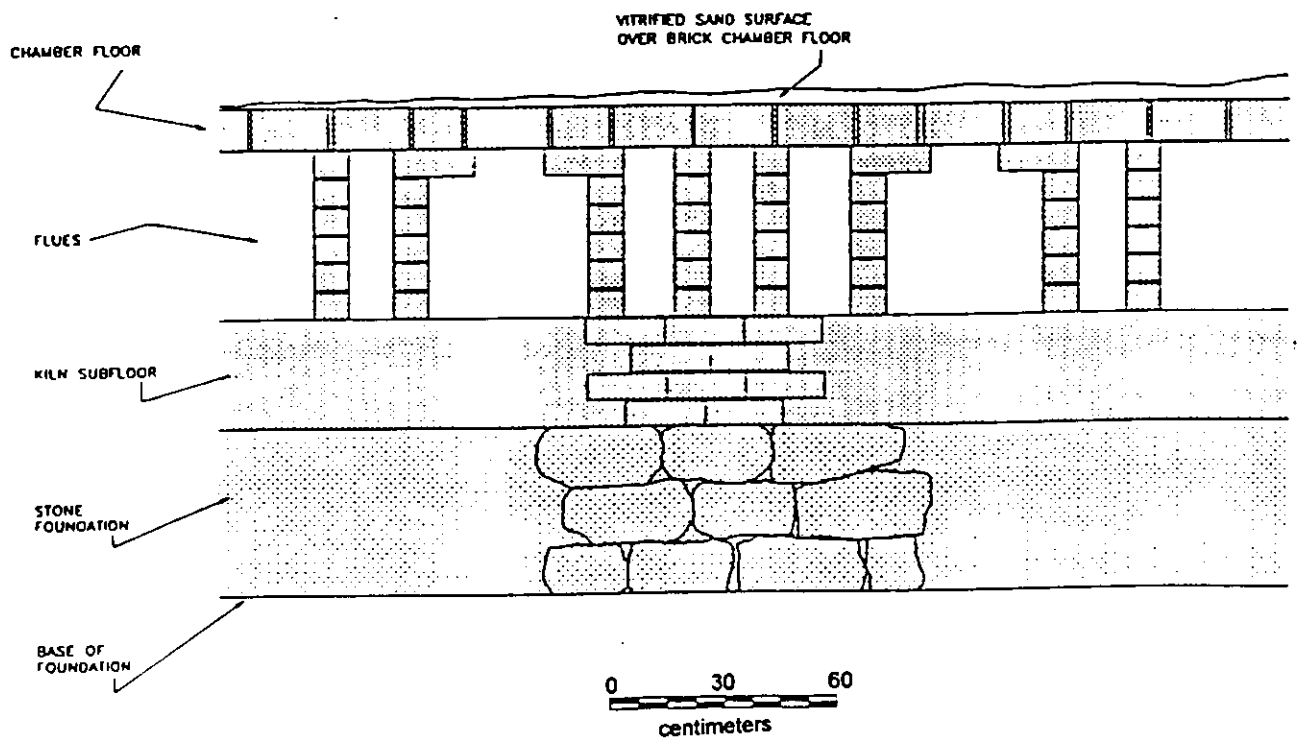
Idealized sectional view through the sub-chamber floor of Kiln 1, Tile Works Site (11-Gr-70).
